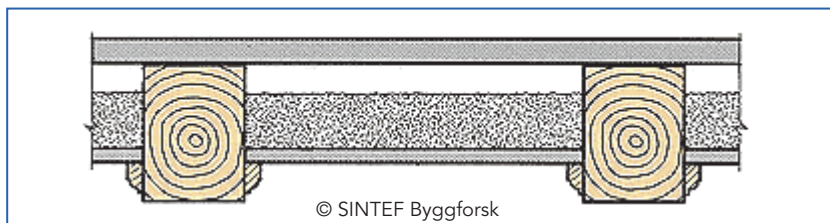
Typical floor construction in multi-dwelling buildings from the period 1850-1930 in Norway (Illustration: Byggforskserien 722.310, SINTEF Byggforsk) [8].
